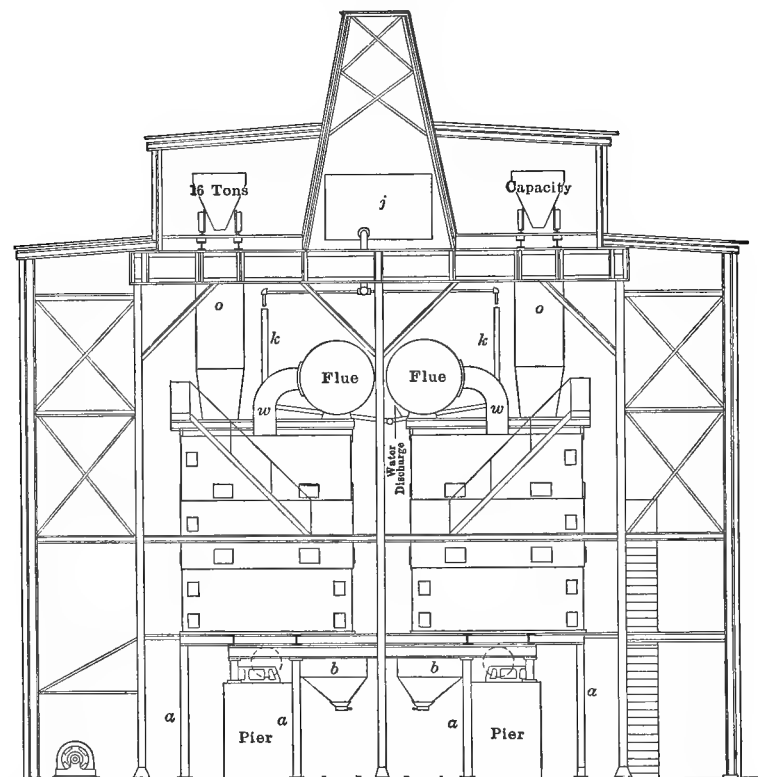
General arrangement of building with Evans-Klepetko furnaces at Great Falls, Mont.
